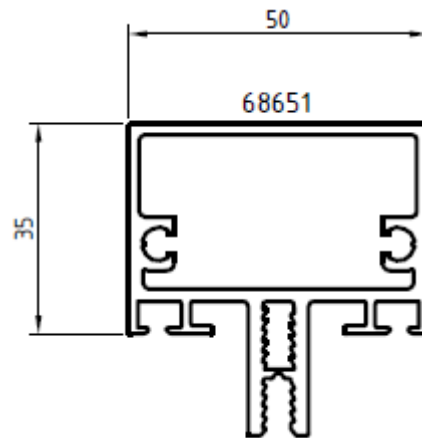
Vertical profiles (Sapa Building system AB, 2012)
